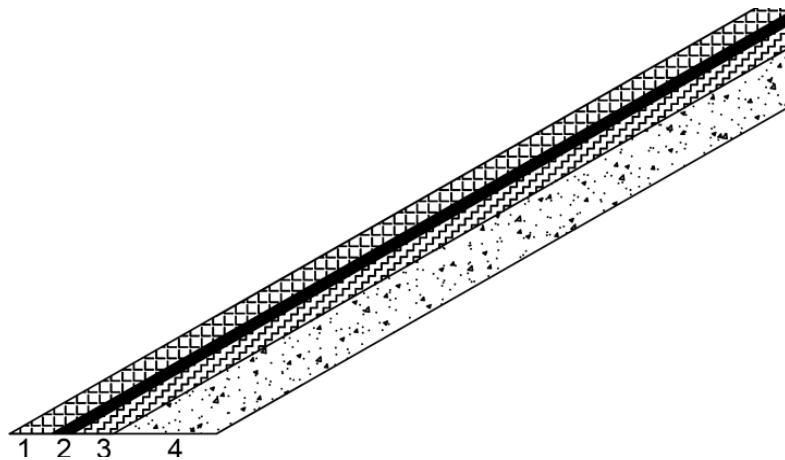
Typical topology detail of an insulated inclined clay tile roof
